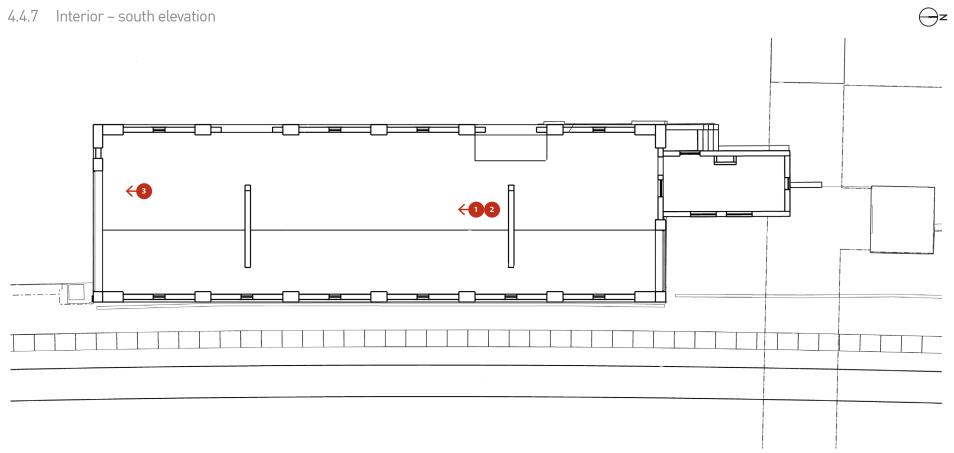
Key plan showing location and direction of photos of the interior south elevation of Goods Shed
